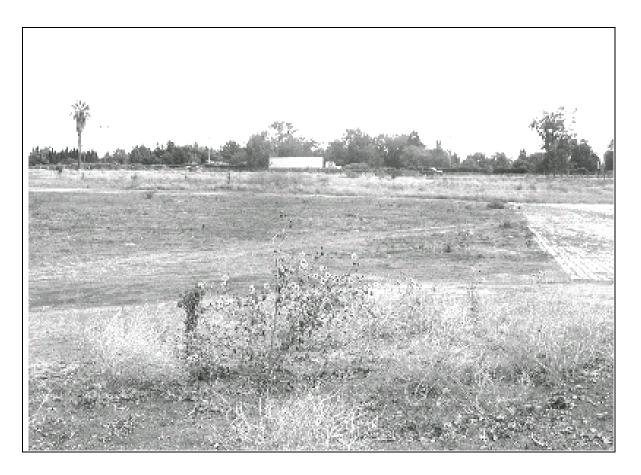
(Cover Photo) View of Demonstration Site #1 looking east across SJAFCA Detention Basin #1 toward State Highway 99. The photos shows the southern edge of basin where proposed 100' by 100' by 2' high berm would be constructed. Noteworthy features are foundation block spillway leading down (north) into the sloping basin and the basin. Levee on eastern perimeter is visible. Vehicles on State Highway 99 are visible in the background.
